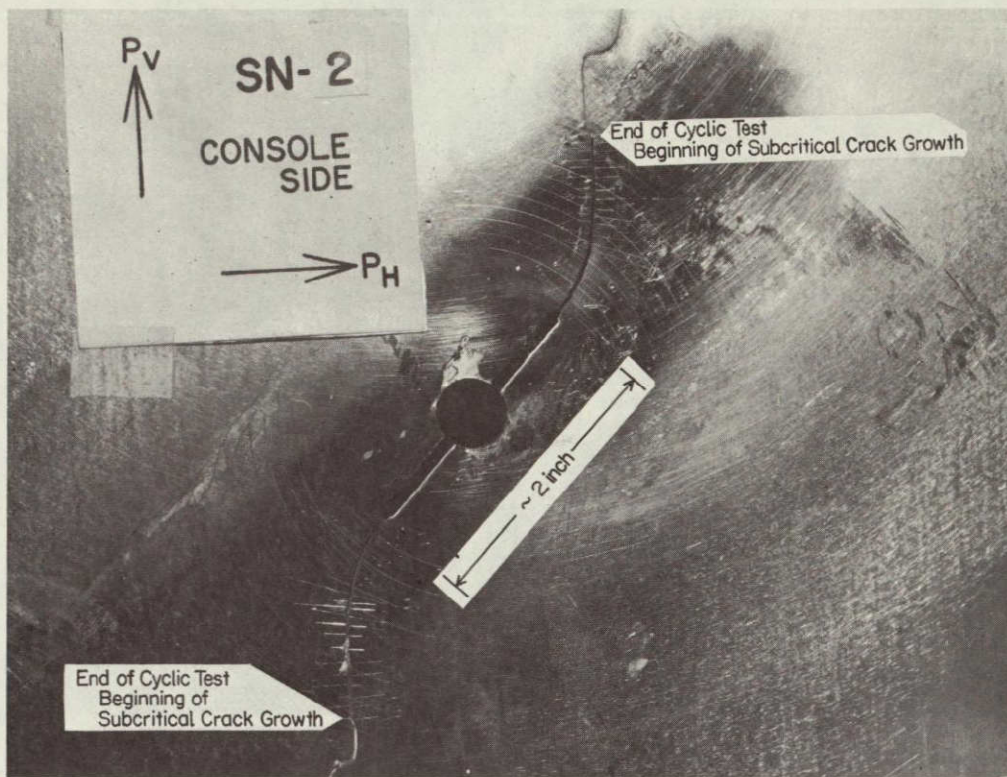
Closeup View of SN-2 after Fracture, Console Side.
